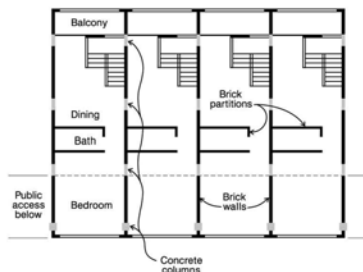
B: Typical Floor Plan -Past Practice (Source: EERI 2001)
